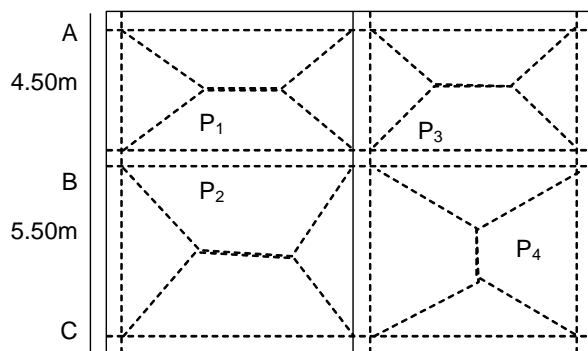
Distribution of load on a beam supporting a two-way spanning slab (CP 110).
